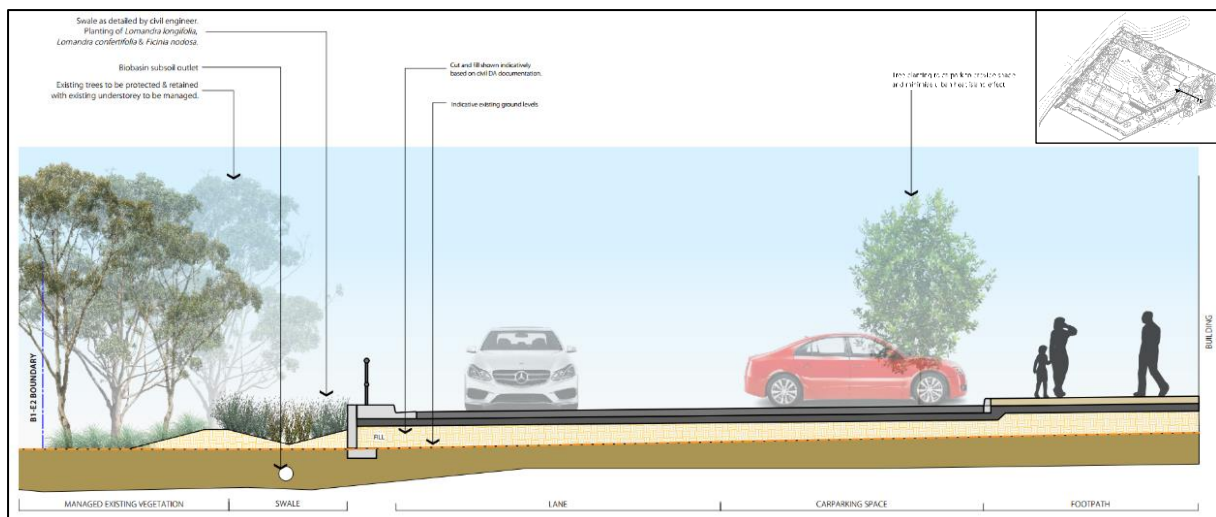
Section E Fullerton Cove Road (Prepared by *terras landscape architects* – L106 26/06/2024 Rev. J)
